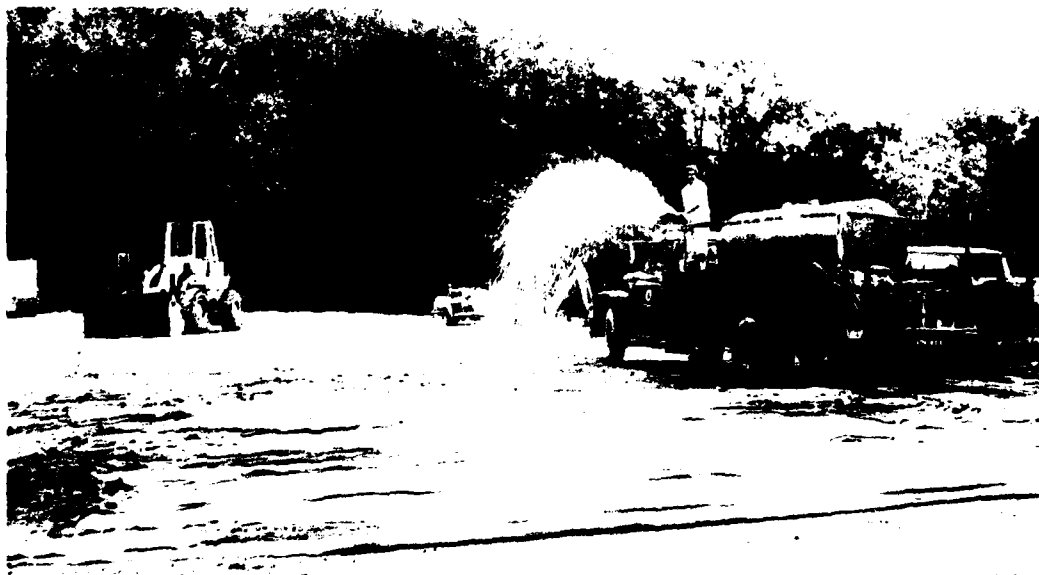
Wetting of burlap covering crater 4 to aid in proper curing of the concrete
